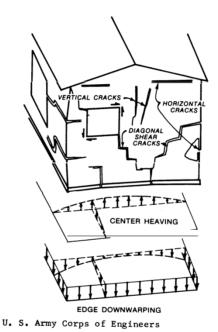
Examples of wall fractures from doming heave of swelling and shrinking foundation soils.
